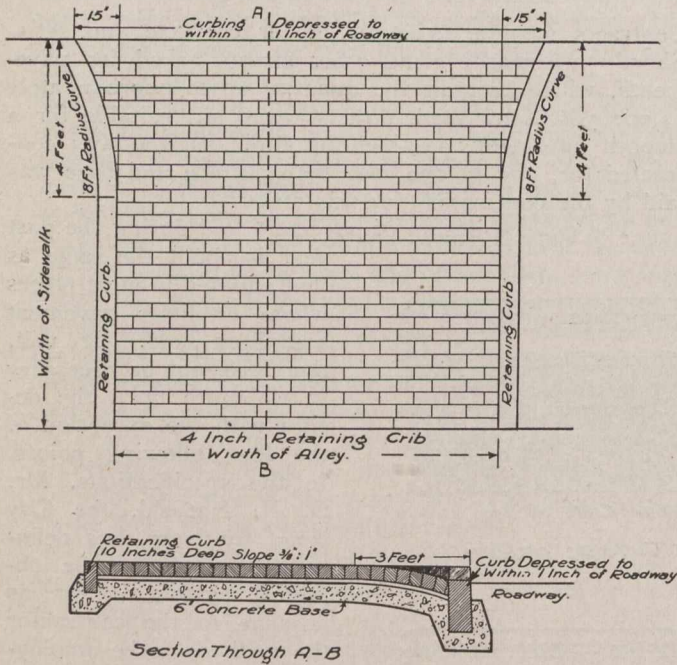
Plan and Section of Type of Paved Alley and Street Intersection Used in St. John, N.B.
